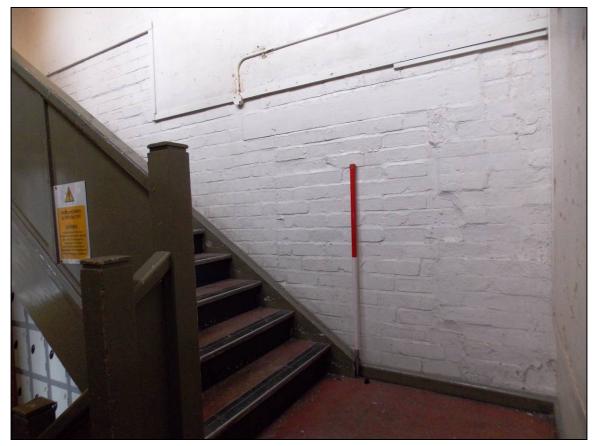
Blocked-up doorway to the southern room, looking east (scale 1m).
